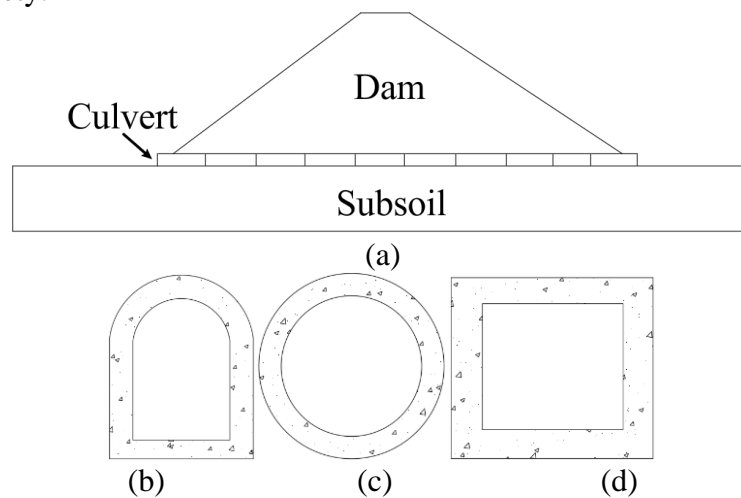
(a) Culvert constructed through the dam from upstream to downstream; (b) City-gate shaped cross-section; (c) Circular cross-section; (d) Rectangular cross-section.
